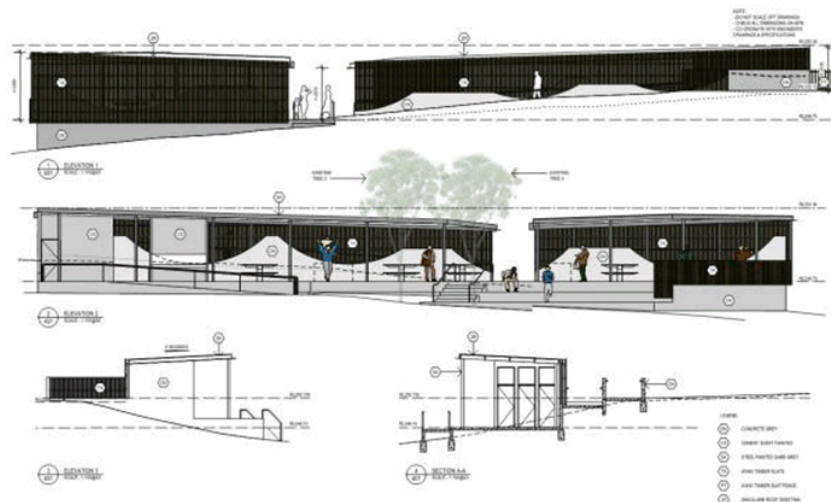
Elevation plans of the proposed development at 8 old Proctors Road.
